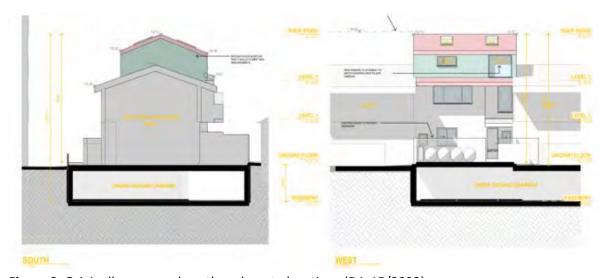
Originally proposed south and west elevations (DA-15/2022)
